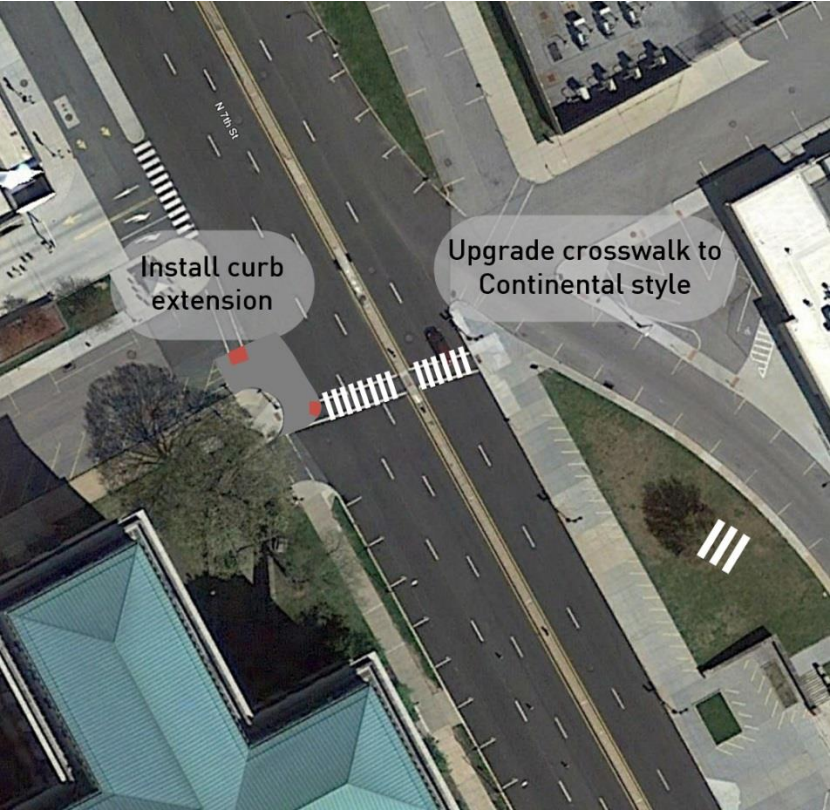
Proposed midblock crosswalk improvements, 7th Street at North Street
